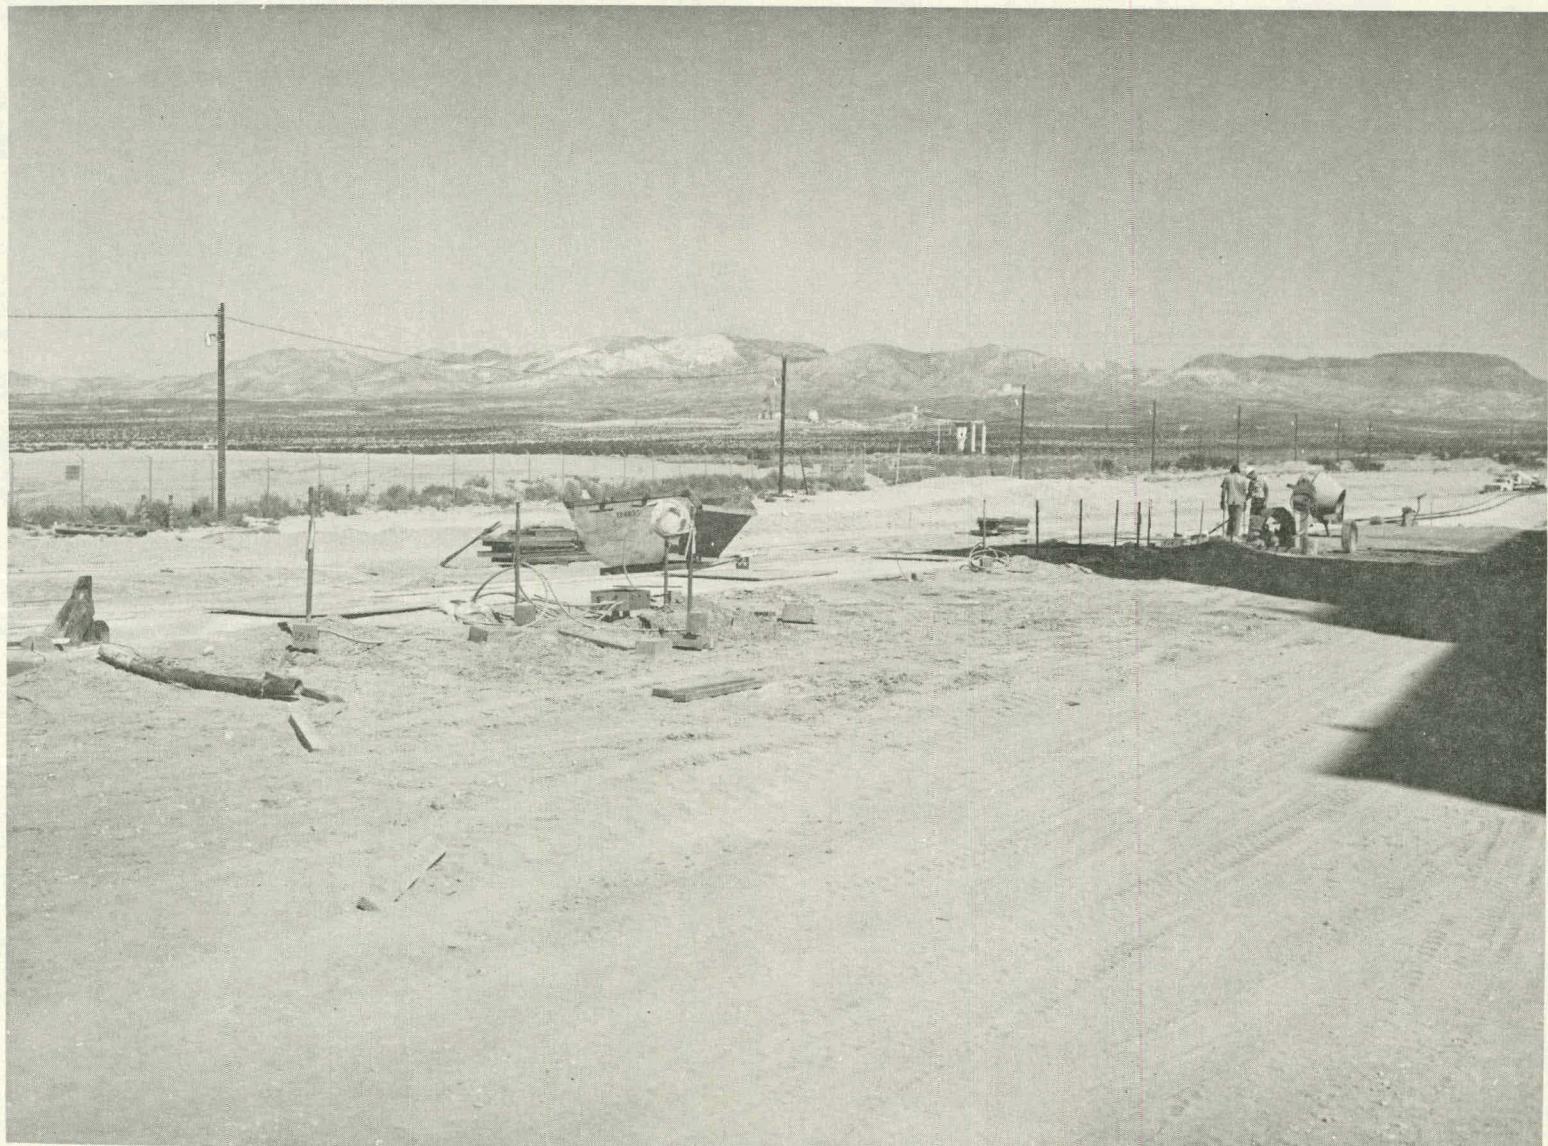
Instrumentation Wells Installed in Drywell Storage Area
